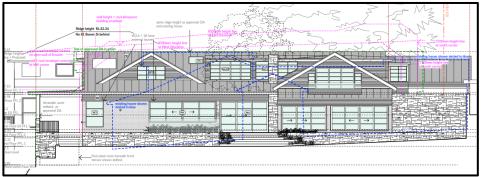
Western Elevation (s4.55 plan set, dated March 2021)
